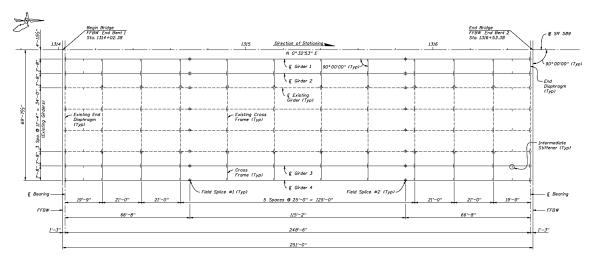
Framing plan of the bridge SR-589 over Waters Avenue
